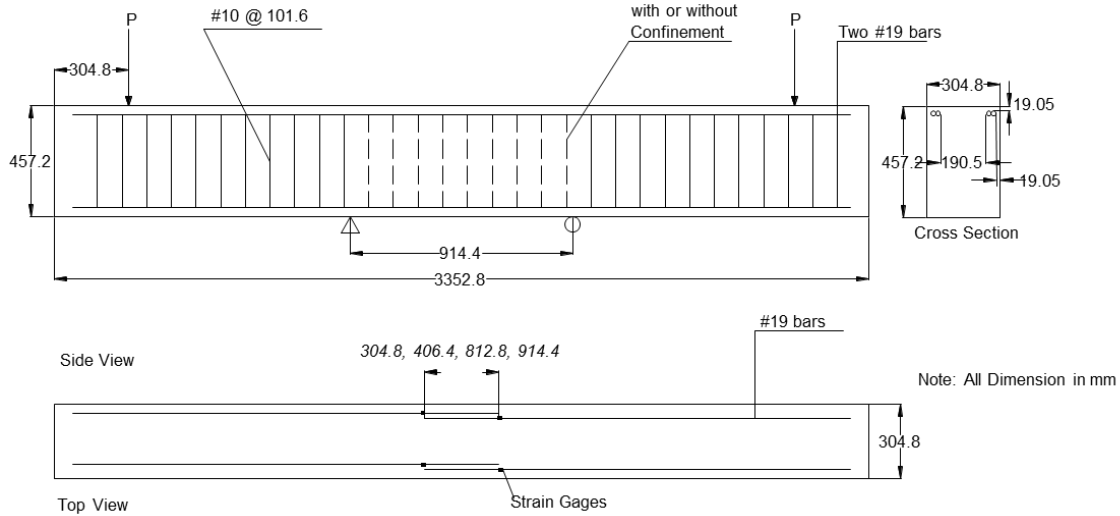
Reinforcement details of series I-L (all units in mm)
